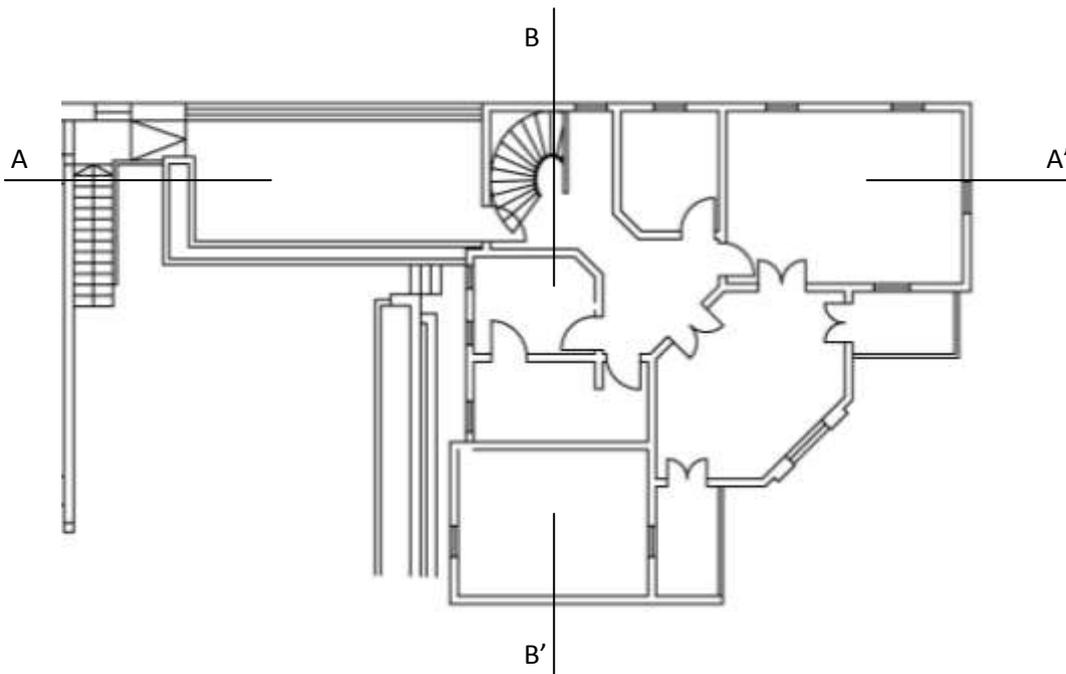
First floor of the house at 151 lot 2 parcel
